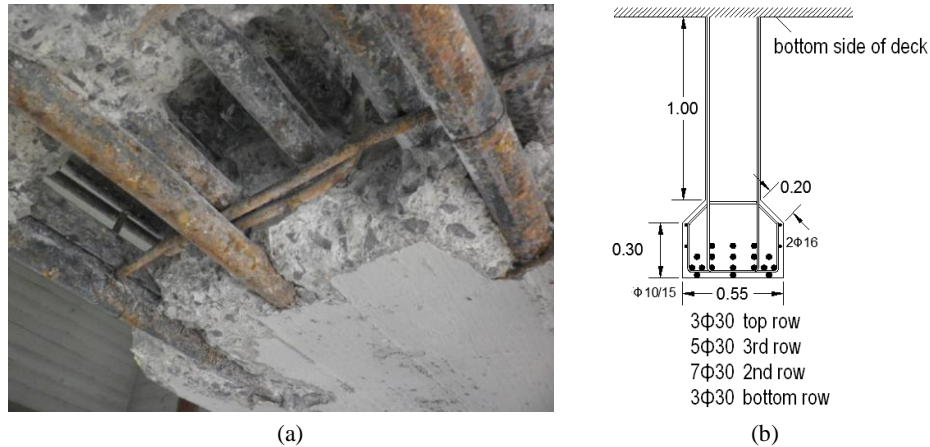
Reinforcement of a representative main girder: (a) section after removal of concrete cover; (b) girder reinforcement.
